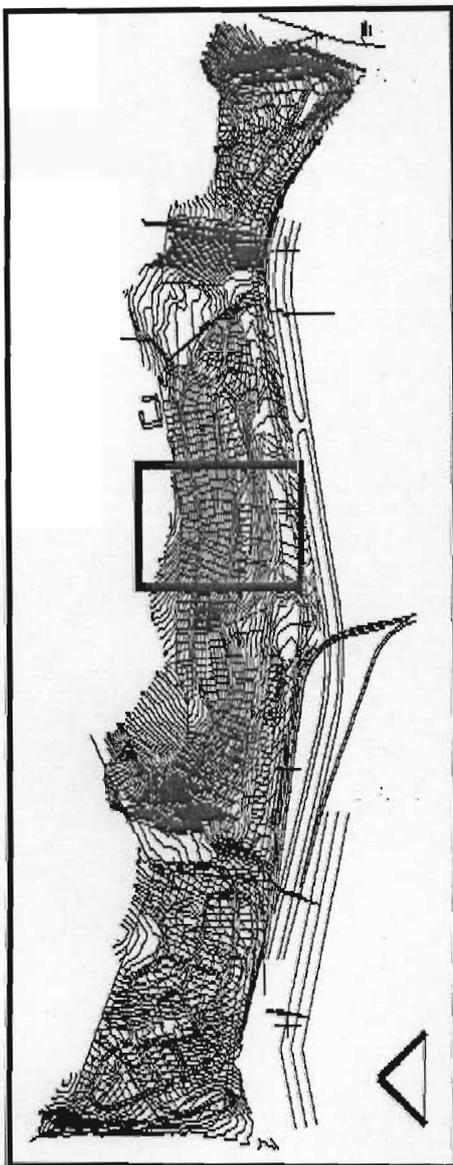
kwaDabeka buffer Layout plan and detail.
